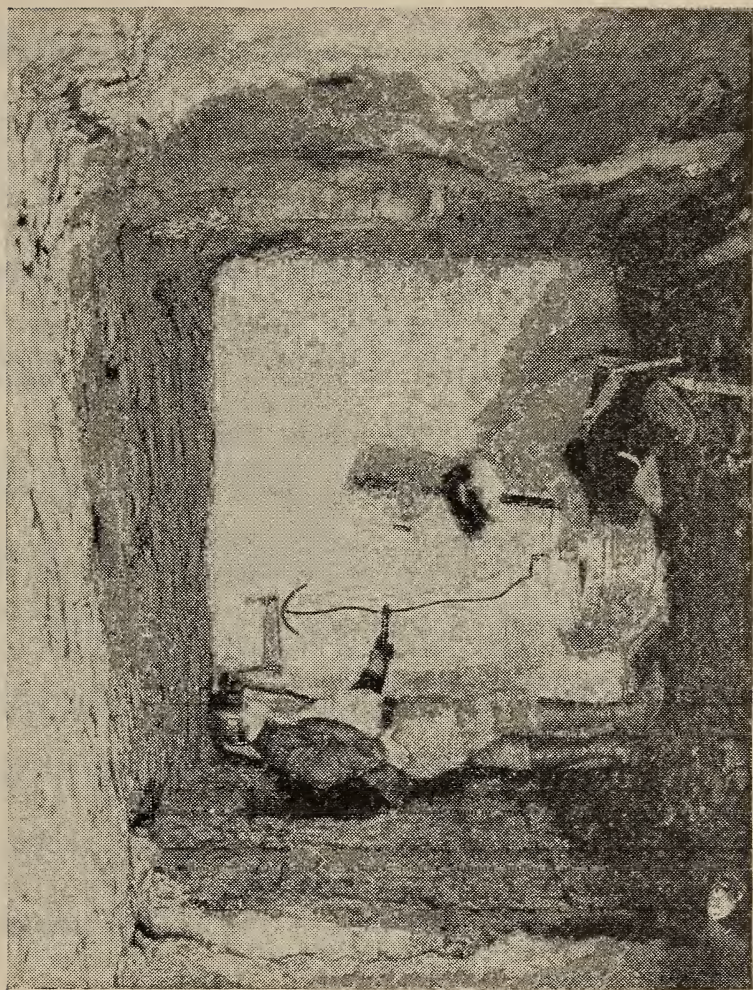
Collecting a sample of air from behind a fire seal. The stopping has been provided with a water gage and breather pipe.
